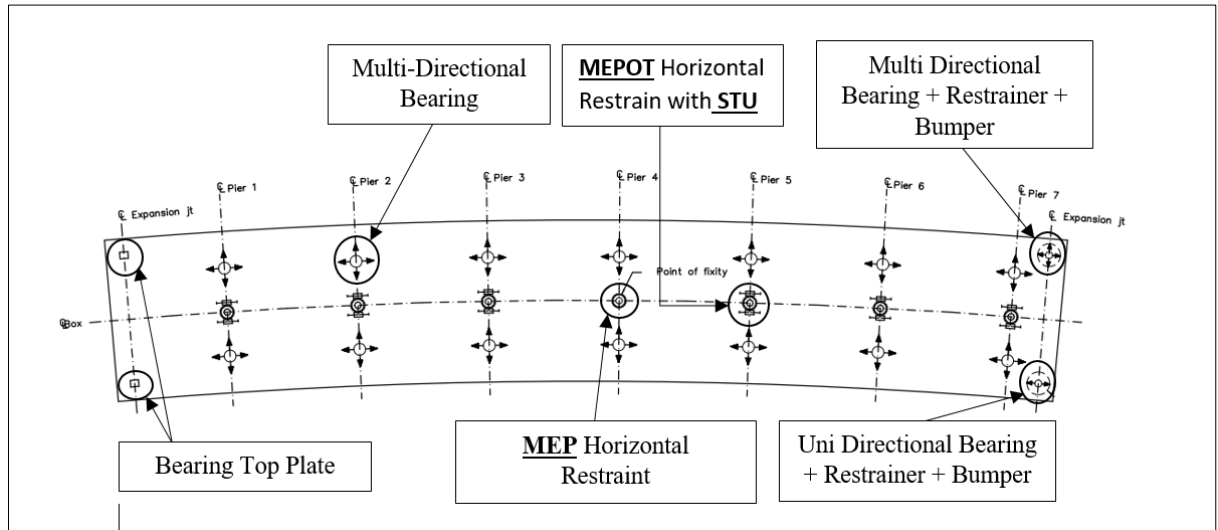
Bearing layout of 7-span module of The Bangabandhu bridge
